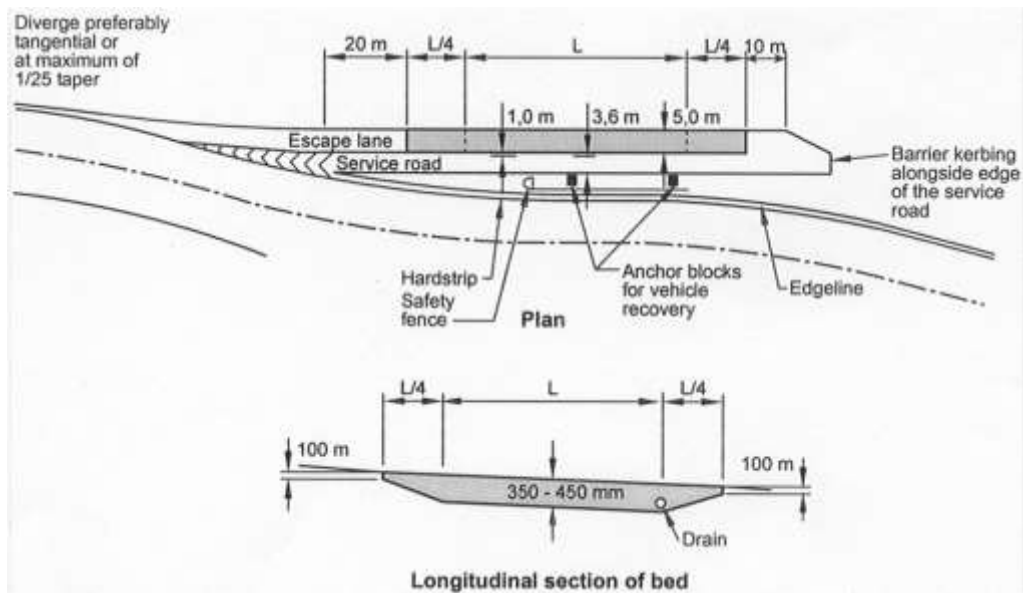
Layout of Arrestor Bed Remote from the Carriageway
